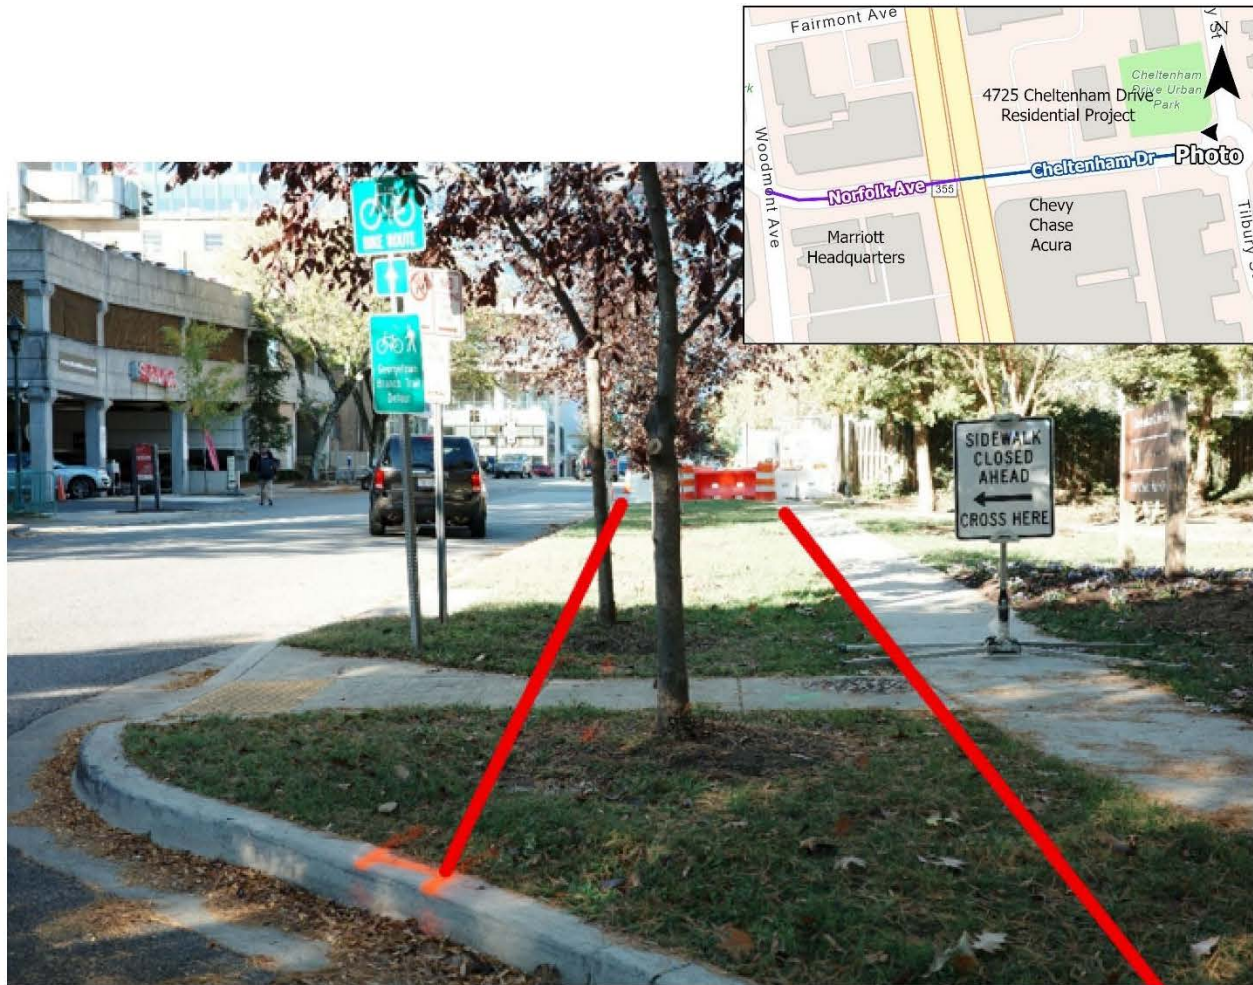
Space for Proposed Separated Bike Lane on Cheltenham Drive (Facing West)
